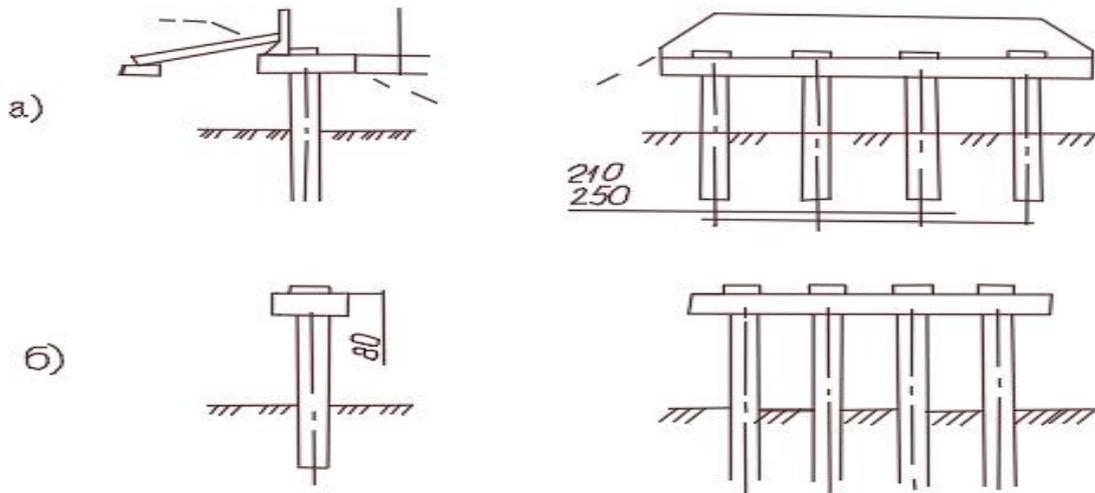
Column supports: a - bridge of the road bridge;
